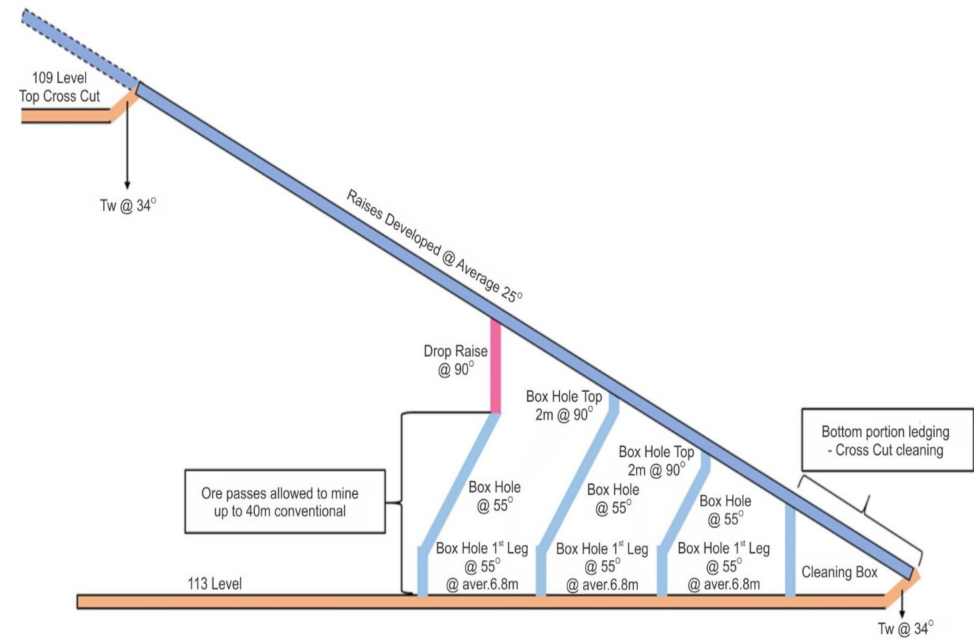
Section of the Blueprint Footwall Crosscut Design at Kusasaletu
